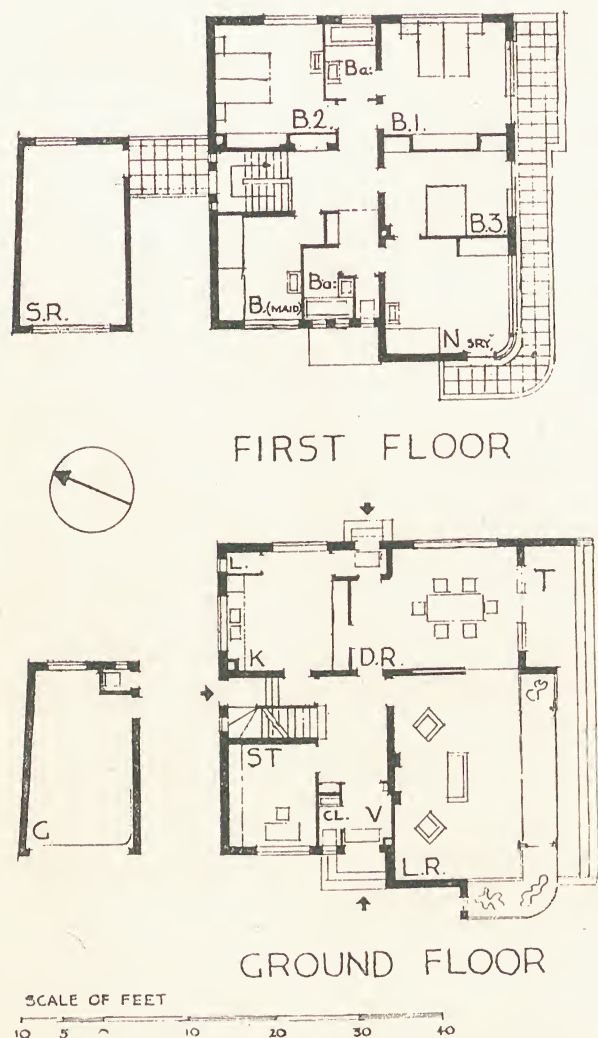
PLAN OF HOUSE AT WIMBLEDON
